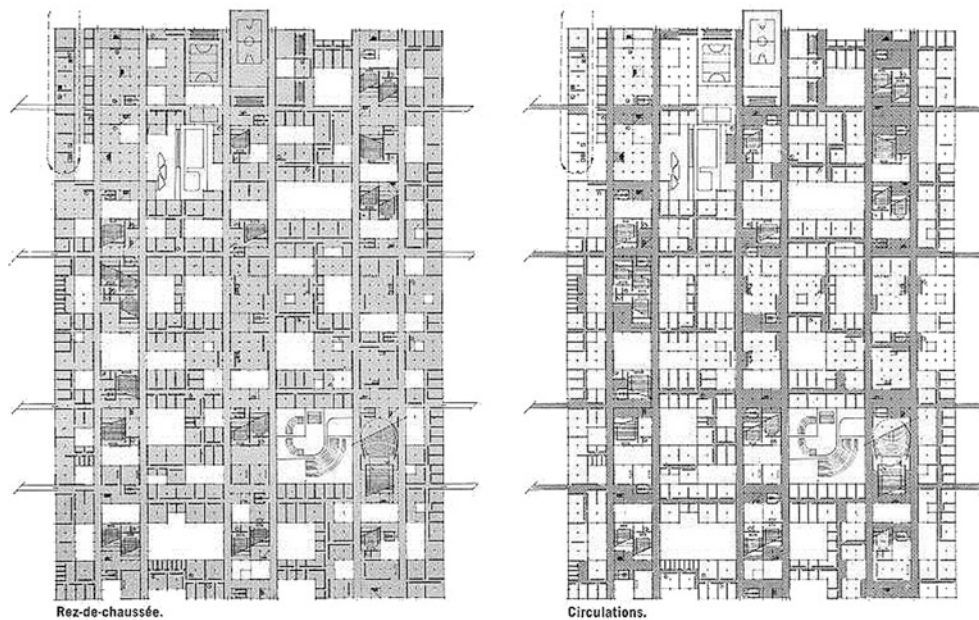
Georges Candilis, Alexis Josic and Shadrach Woods, University of Toulouse-le-Mirail, 1968. Ground floor
